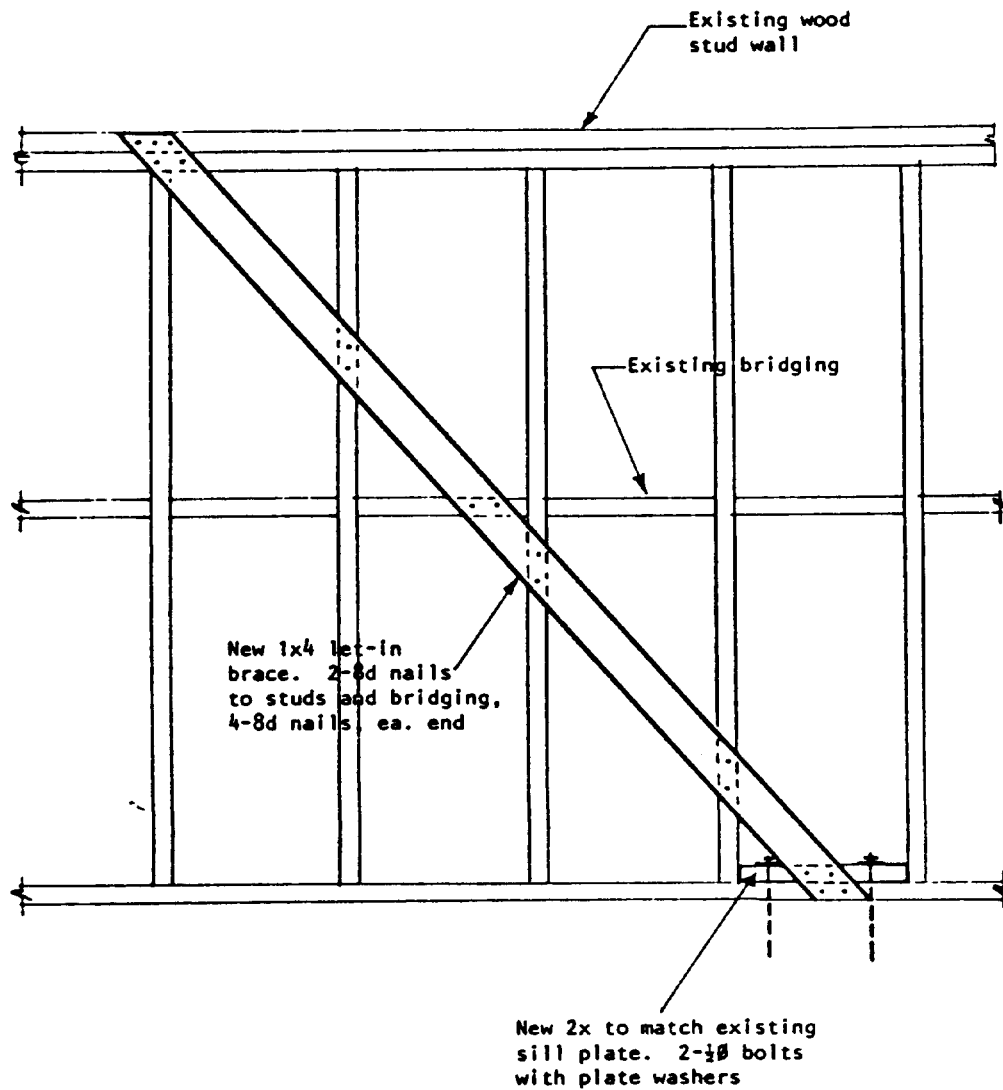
Strengthening existing wood stud walls with let-in bracing
